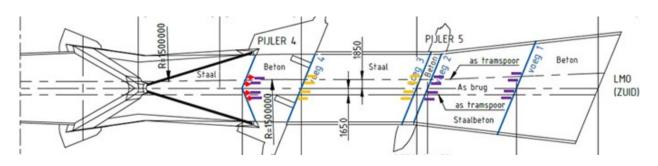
Figure XII: Top view of bridge section with modifications indicated: \rightarrow = shifted joint, \ = deck stiffening and cork rubber support, \ = diagonal rail joint with cork rubber support and concrete base.
